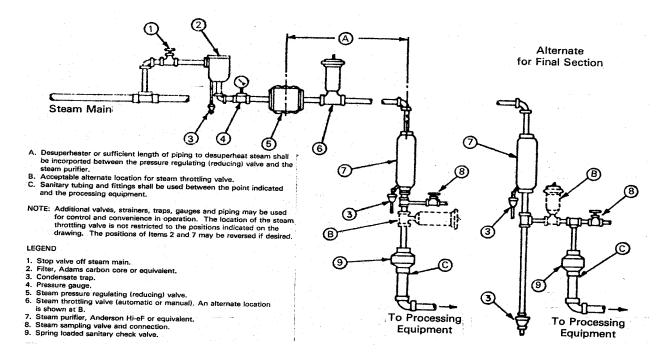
Culinary Steam Piping Assembly for Steam Infusion or Injection
